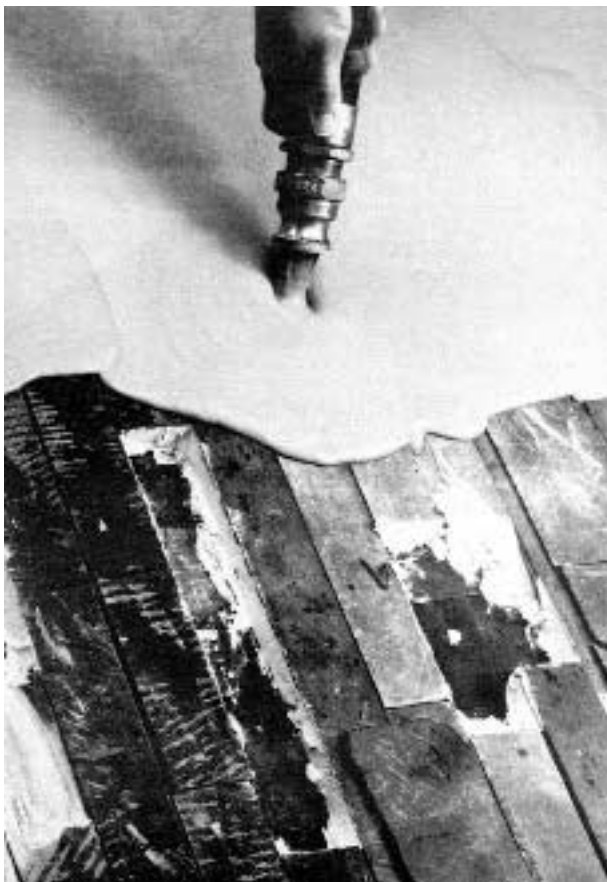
Self-leveling concrete underlayment is a good choice for renovating bumpy, out-of-level, or damaged floors.
